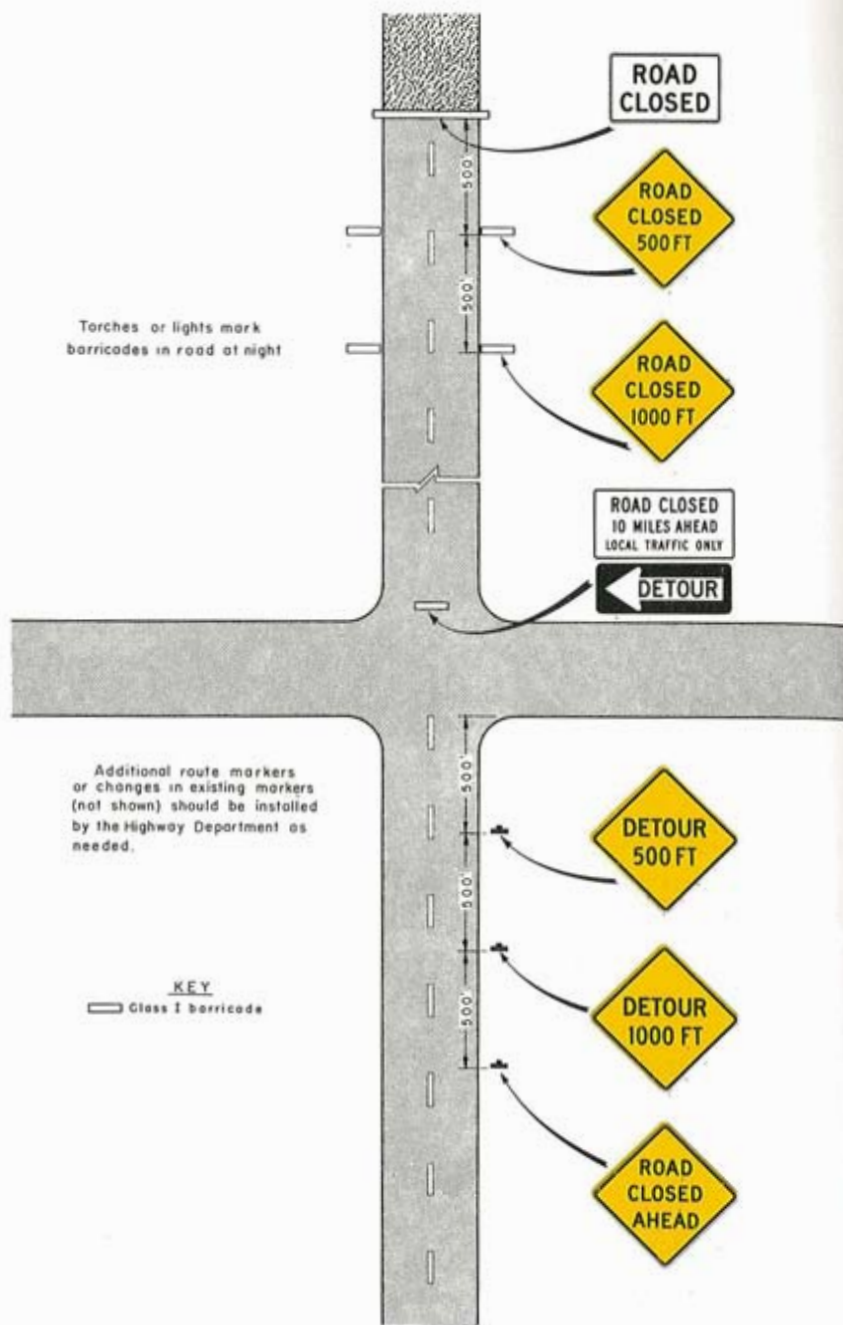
Typical applications of traffic control devices where a road is closed beyond a detour point.
